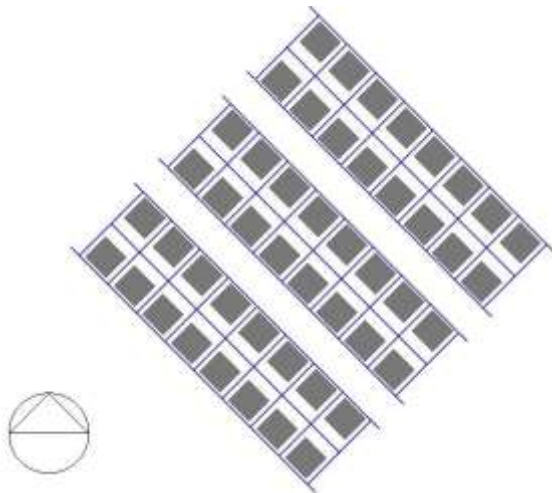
Street direction North-West (N-W) to South-East (S-E) with street width 16m and FAR 0.4.
